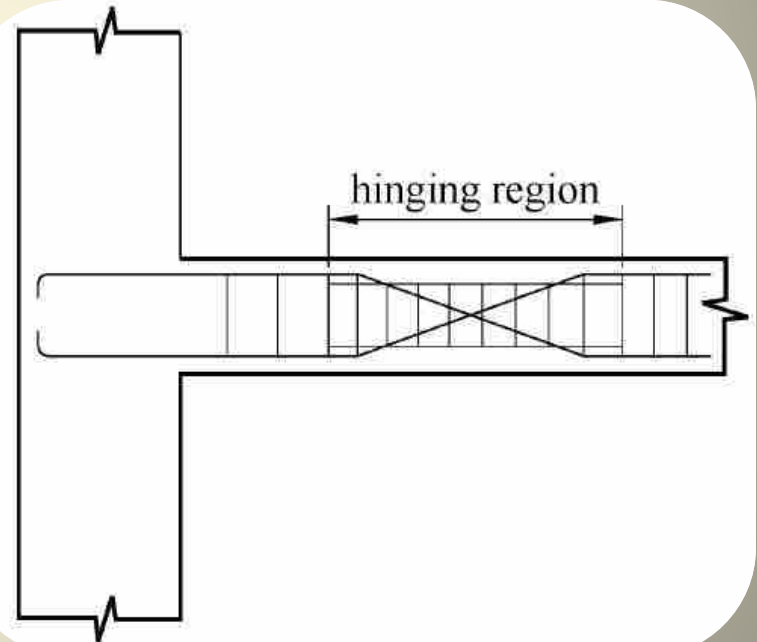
Crossing diagonal web reinforcement in combination with vertical web steel for hinging regions under high shear.
